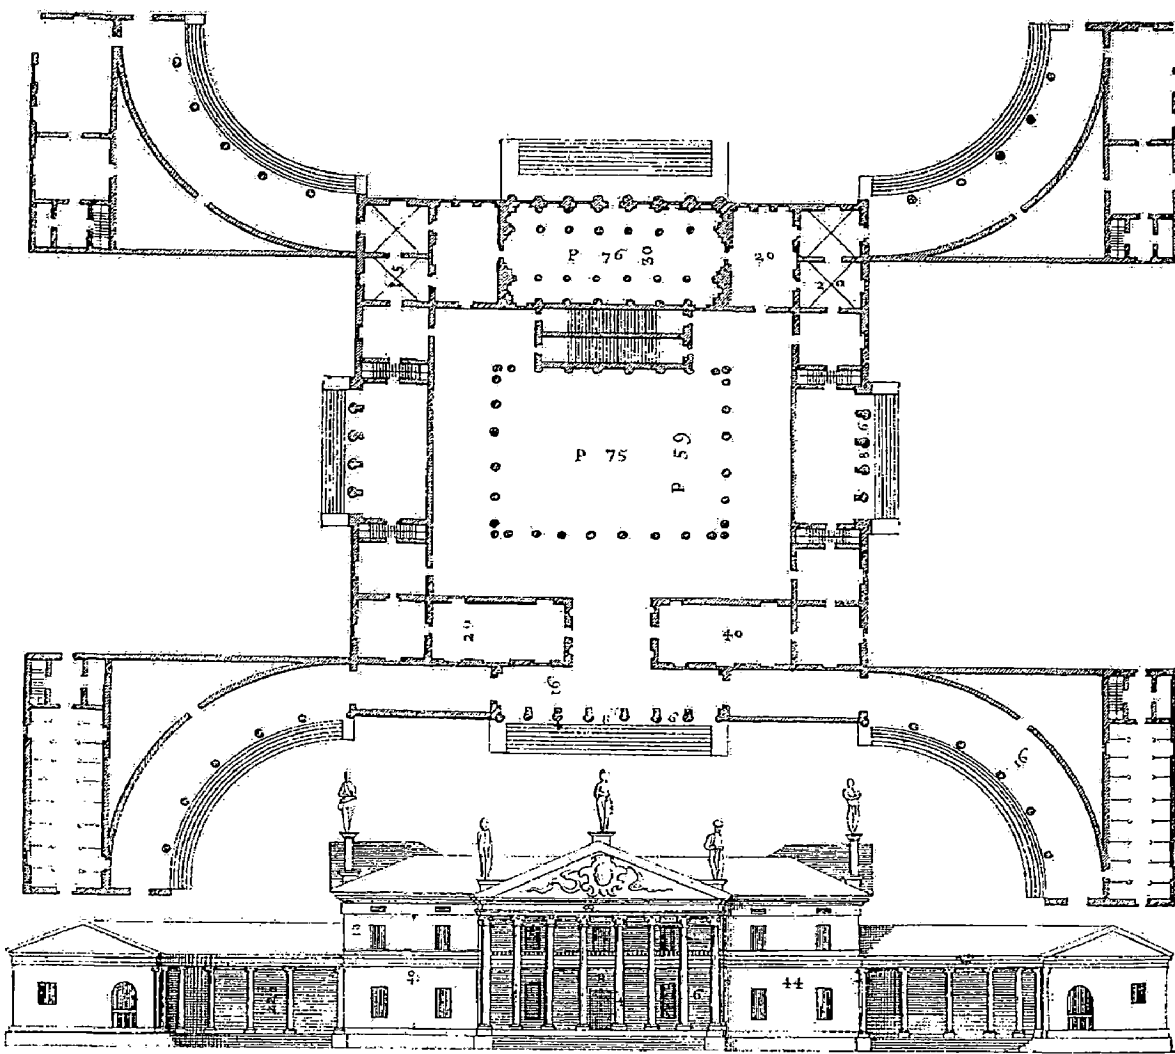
A project of Villa for Leonardo Mocenico in Brenta in plan and elevation
